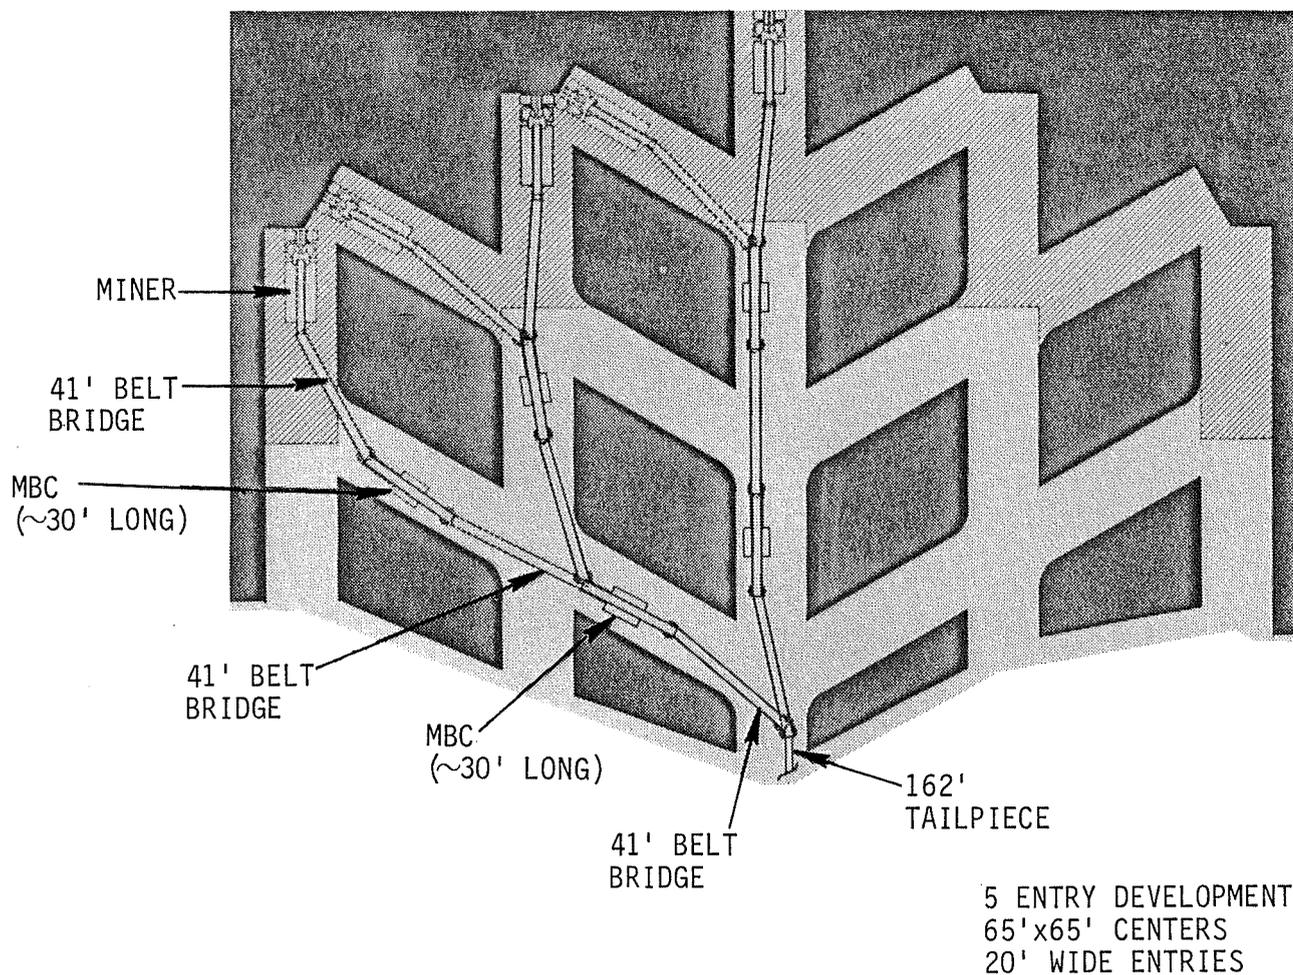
Entry mining plan with 5-element bridge conveyor bridge carrier haulage system.
